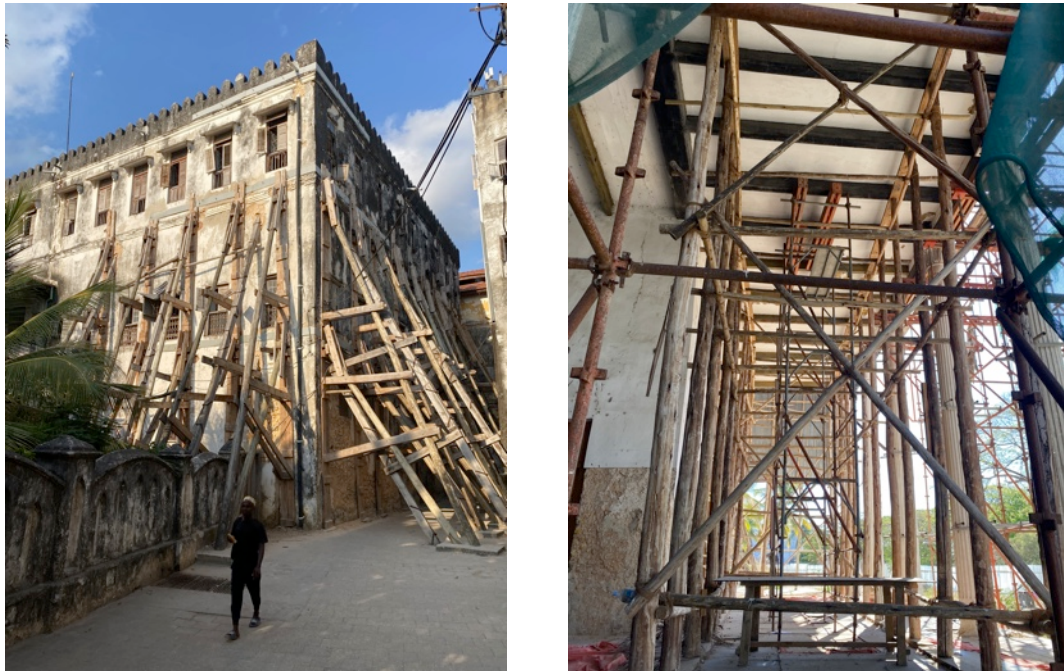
Heavy temporary timber support from Palace Museum (left) and steel support in House of Wonders (right) (Author)
